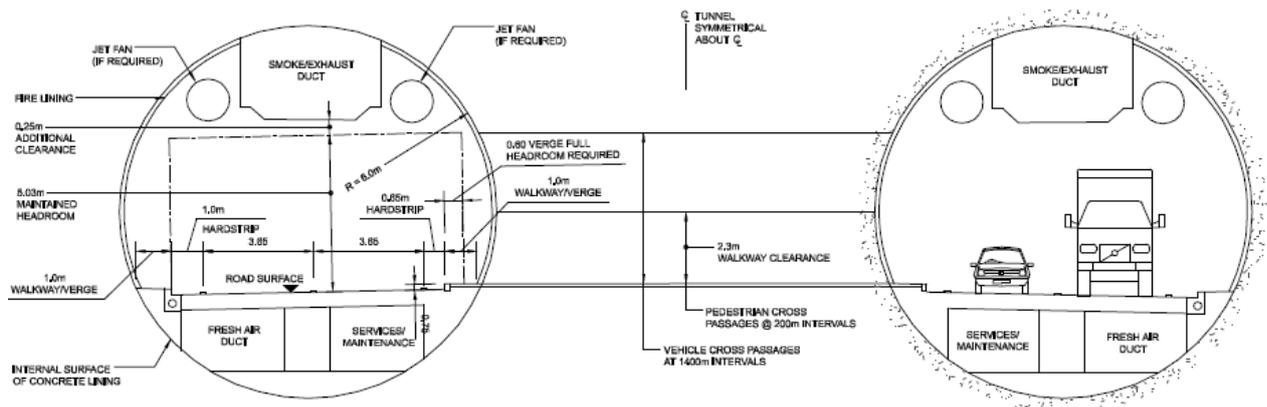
Typical Cross Section for a Mined SCL Tunnel.
